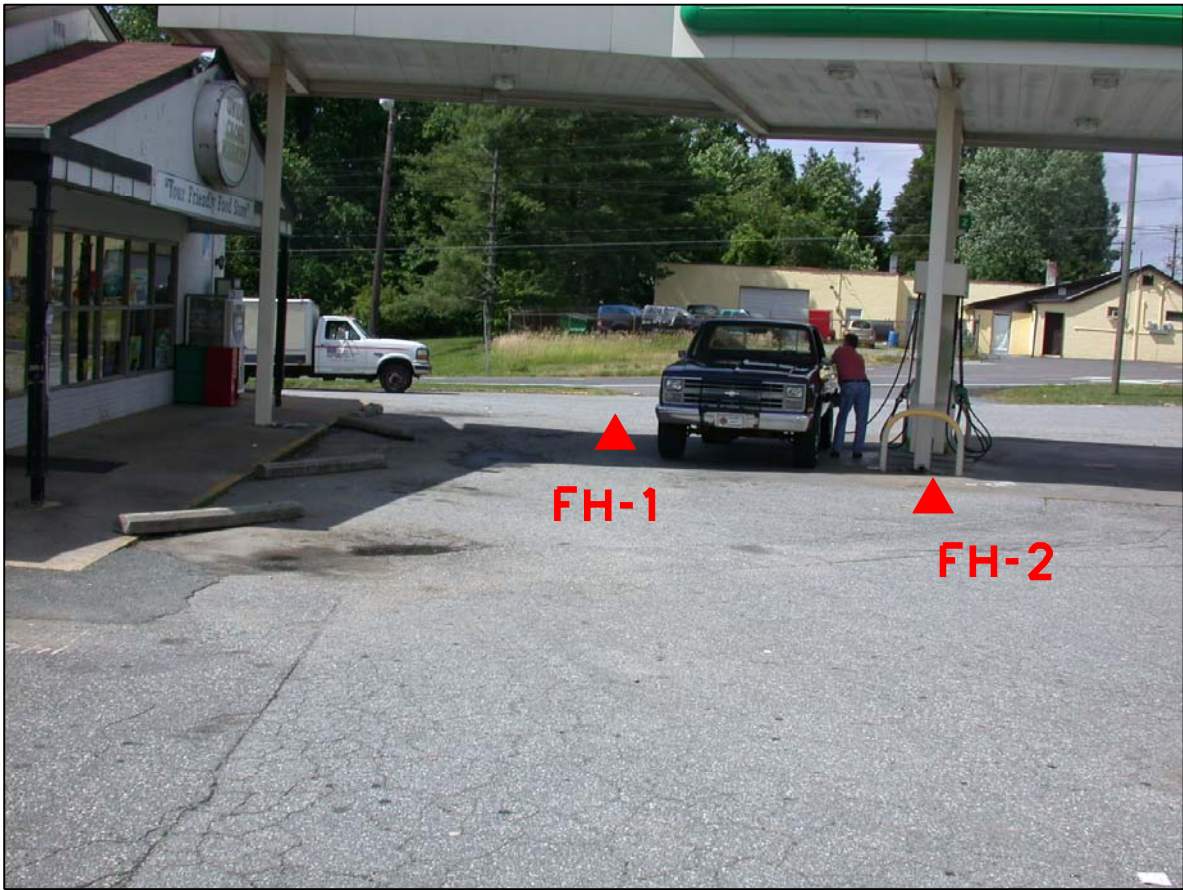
BORING IN PROPOSED R/W LOOKING SOUTH
